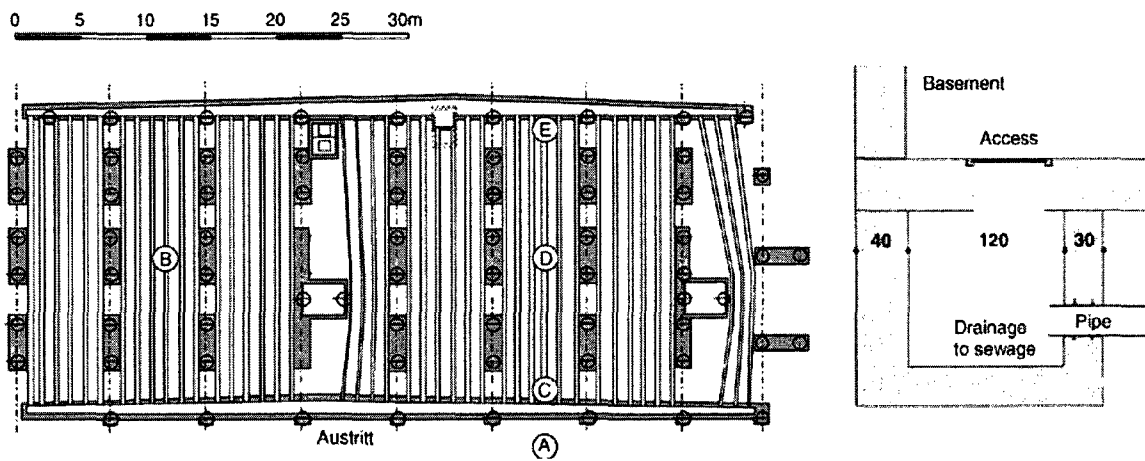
General layout and construction detail of the ETAHE system in the Schwerzenbacherhof building (Holzmüller 2002)
